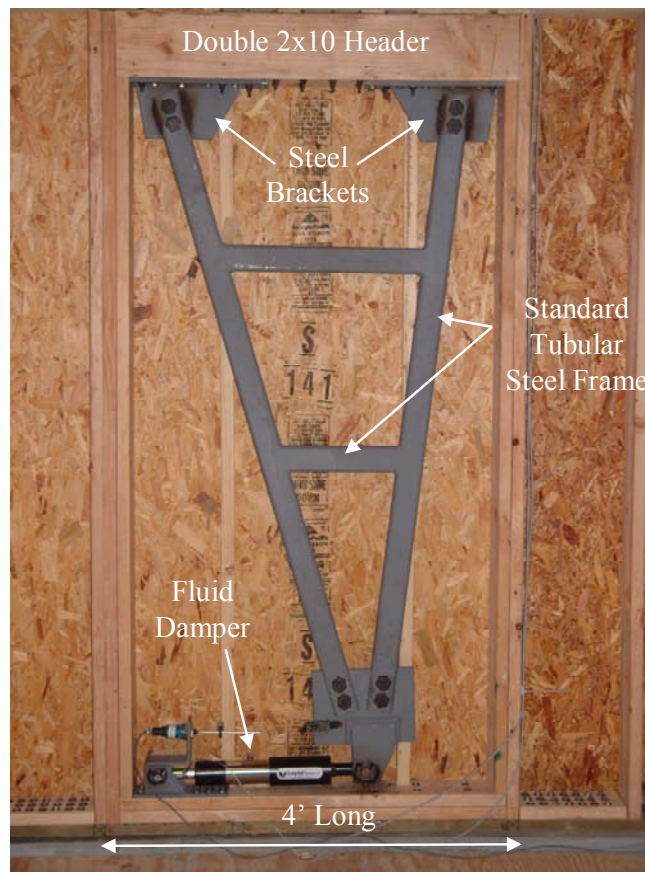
Damper-wall unit installed at the south side of the garage (view from inside)
